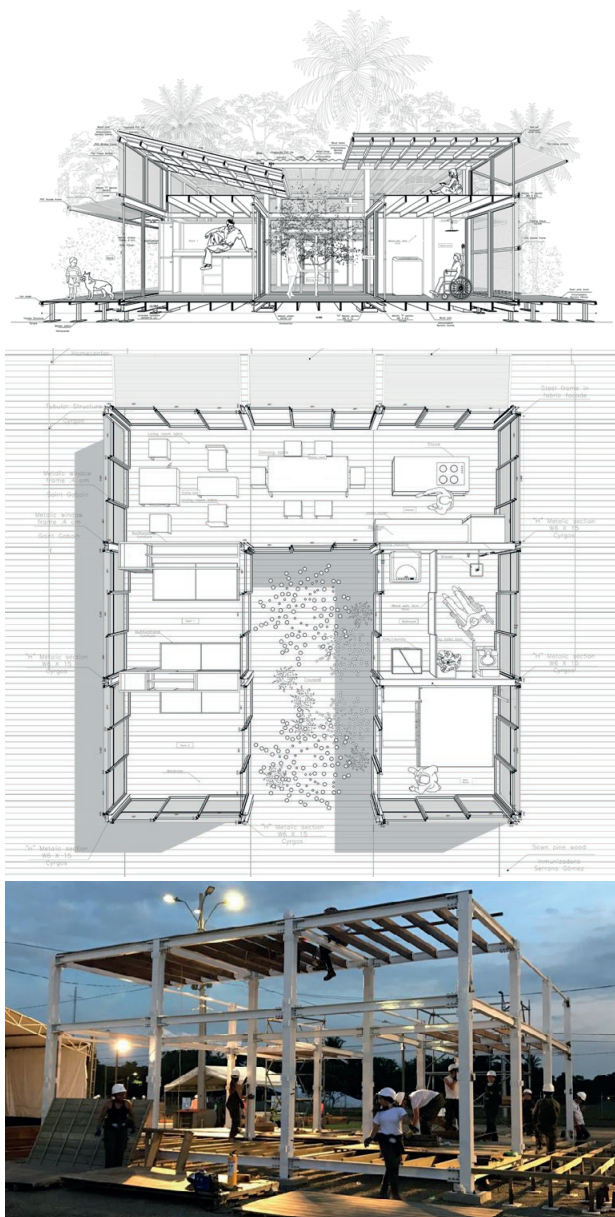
| Perspective section, plan of the *PEI Máquina Verde – El Arca* prototype and photo of the structure under construction. Source: PEI Team.
